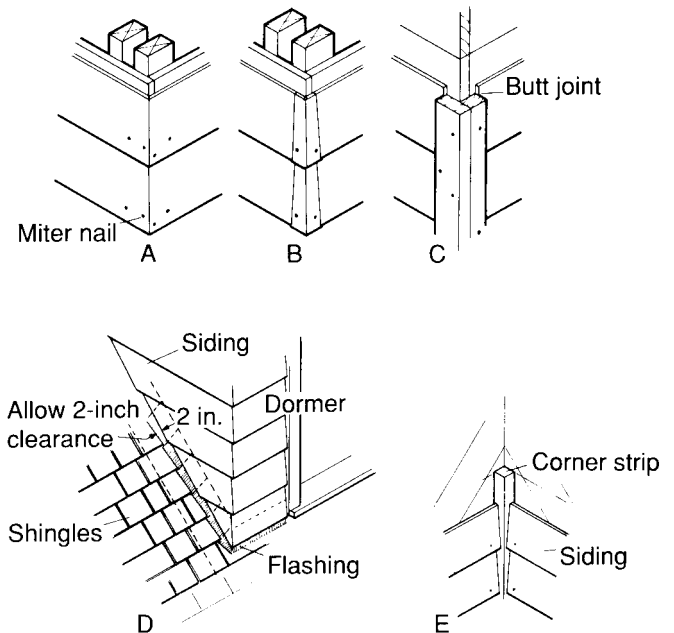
Recommended procedures for corners of siding: (A) miter corner, (B) metal corner, (C) corner boards, (D) siding return at roof, and (E) interior corner. (M 134 776)
